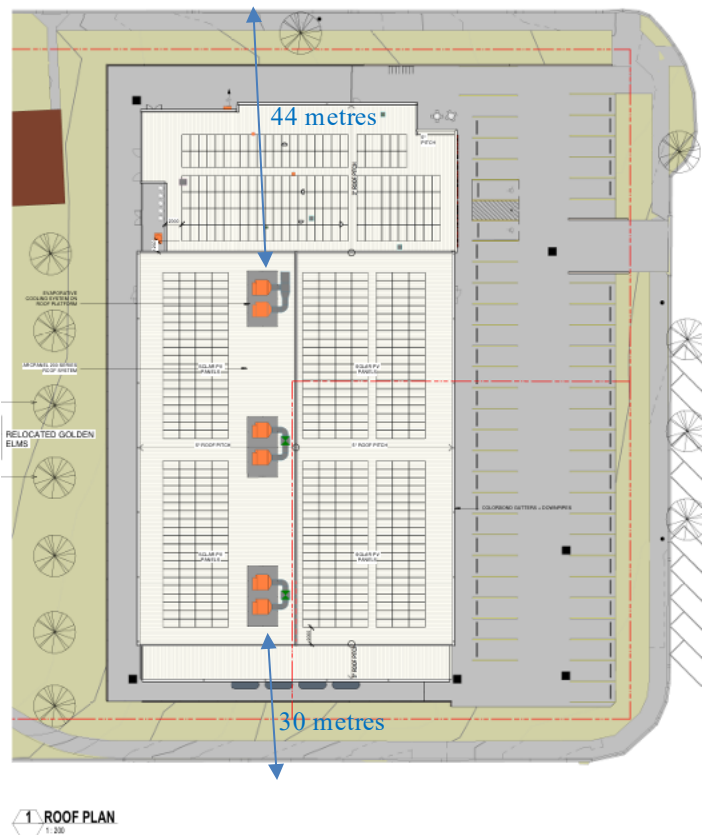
Plan to Show the Location of the Proposed Basketball Roof Top Mechanical Plant to the Nearest Residential Boundaries. Source: The Facility Design Group.
